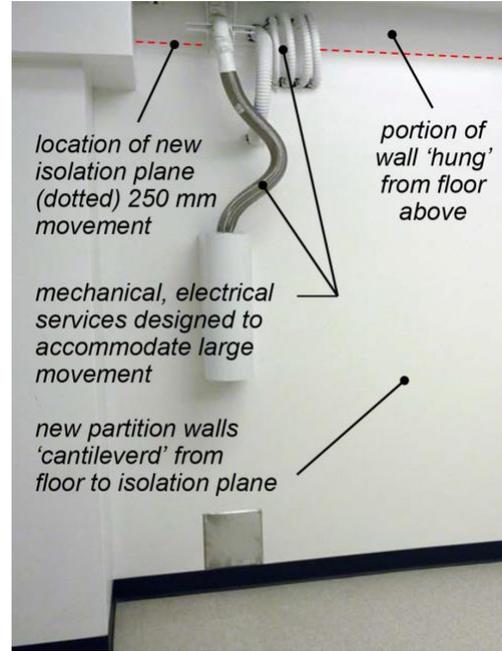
Illustration of basement wall and details to accommodate 250 mm movement at isolation plane.
